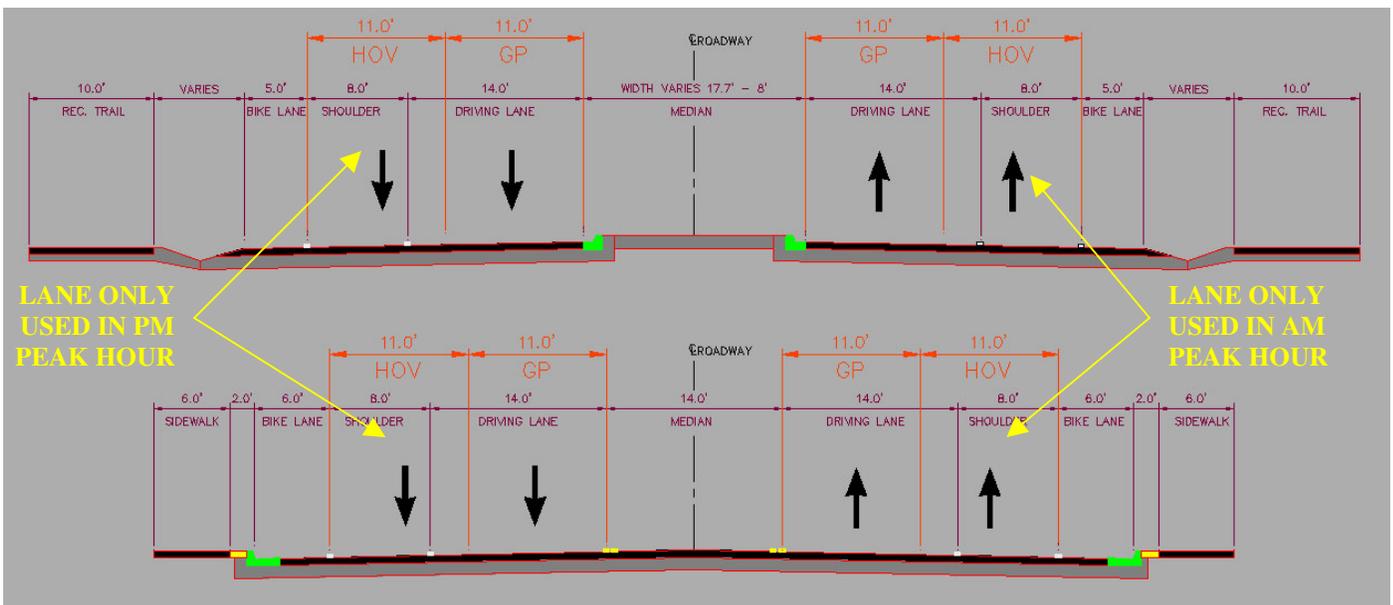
B – *Montañó Road Typical Roadway Section with 2 Outside HOV Lanes with 2 Inside General Purpose Lanes
